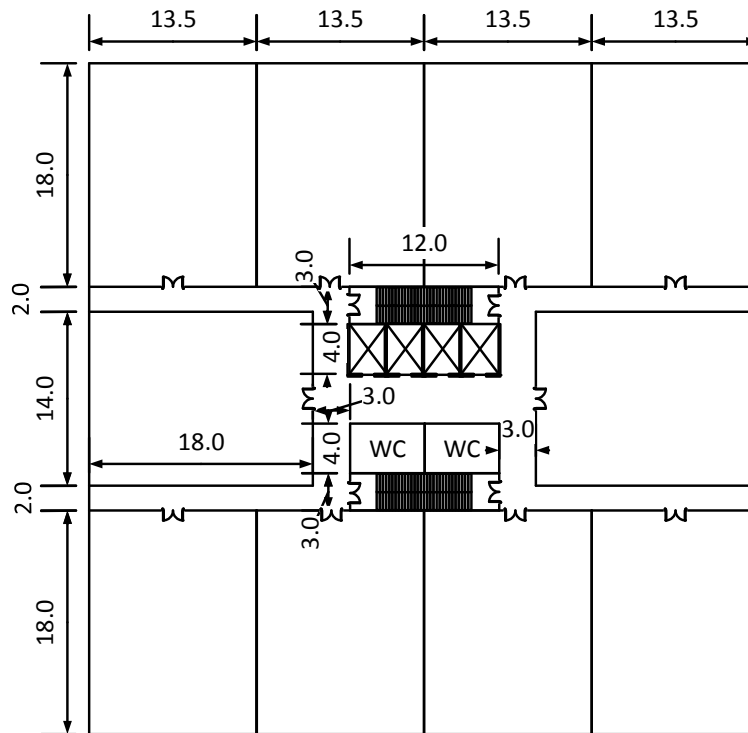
12-Storey Compartmented Office Building – High Floors
